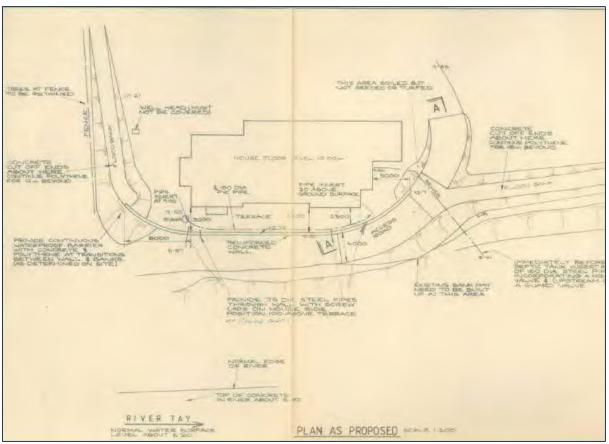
Excerpt from original design drawing of flood wall by Allen Gordon Consulting Engineers (3 of 5)
